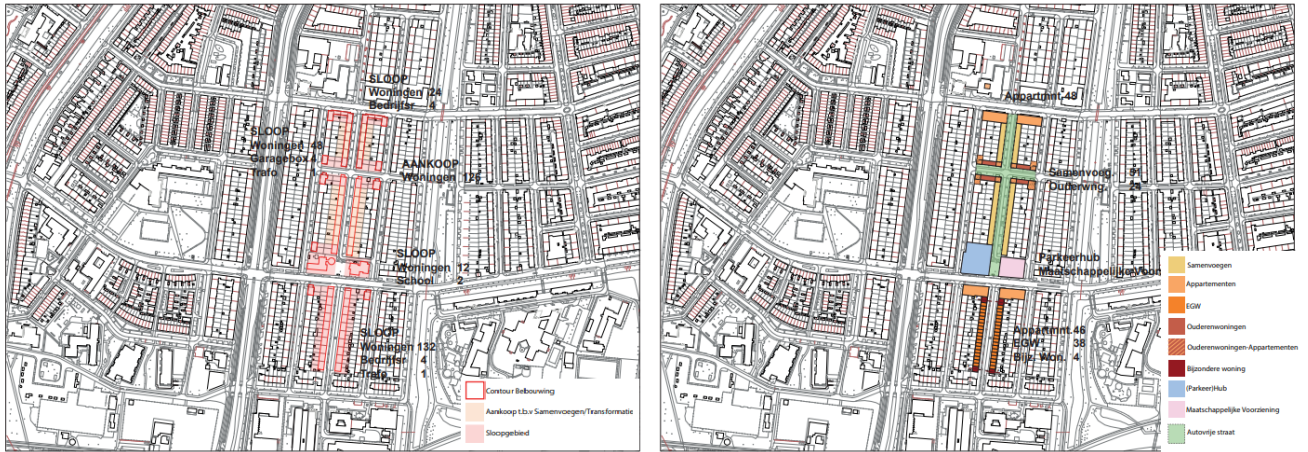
Overview of schematic plans Fazantstraat (source: Gemeenteraad Rotterdam, 2020)
